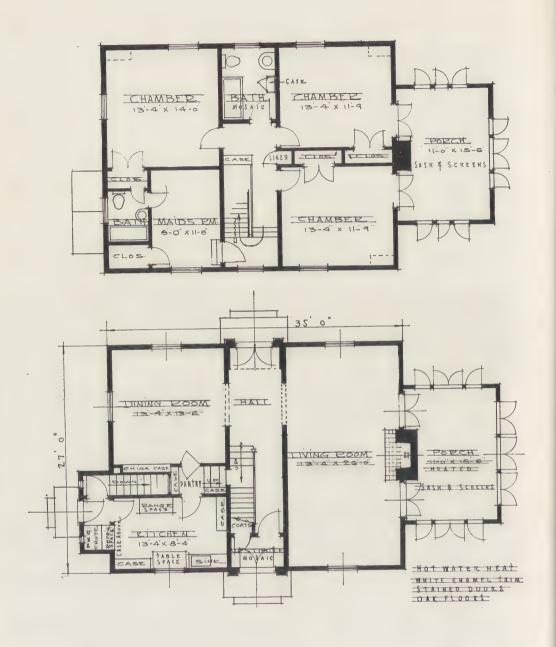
FIRST AND SECOND FLOOR PLANS—HOUSE OF F. E. PAYNE, GLENCOE, ILL. J. A. ARMSTRONG, ARCHITECT.
